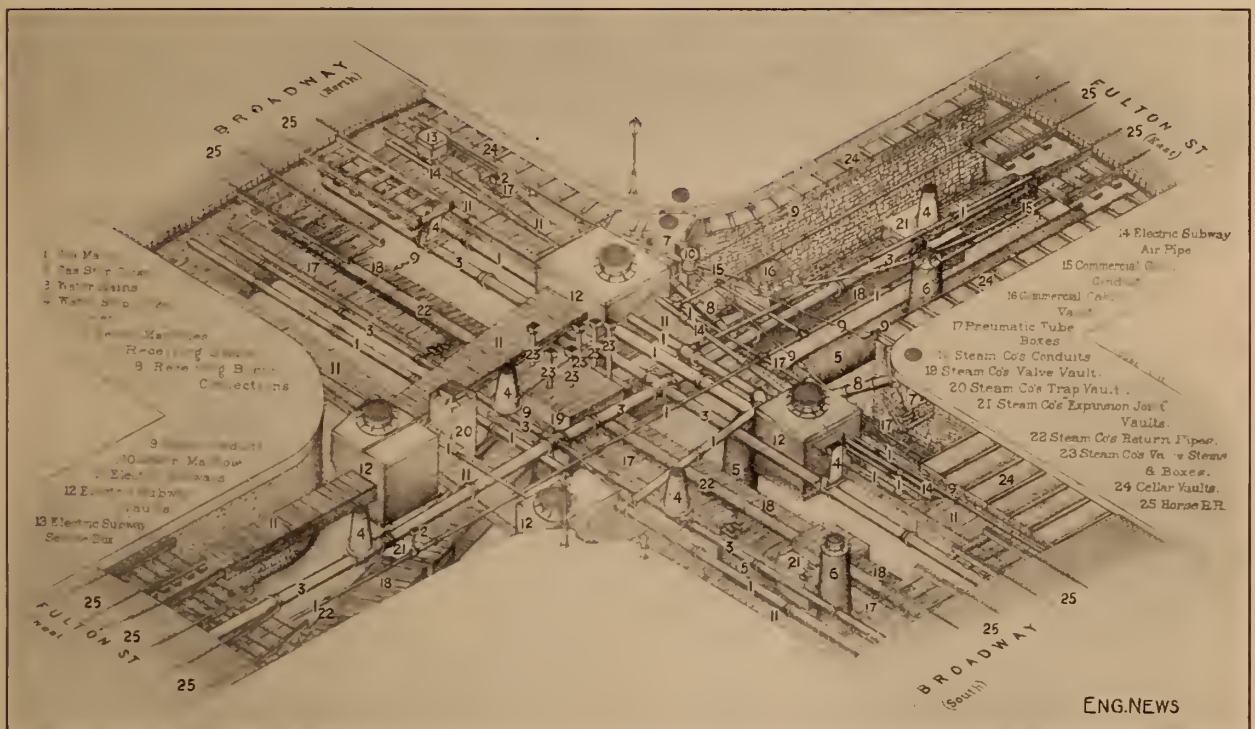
ISOMETRIC VIEW OF UNDERGROUND PIPING AT THE INTERSECTION OF BROADWAY AND FULTON ST. IN 1890
